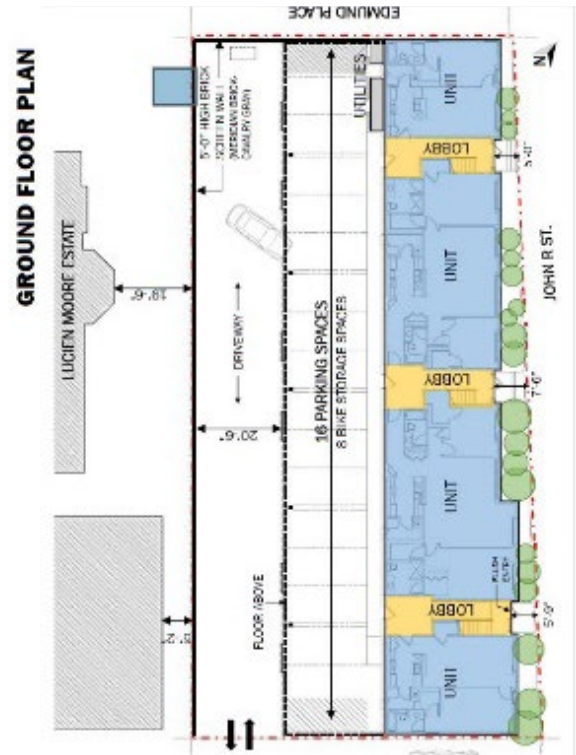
Showing originally approved Site Plan with location of screen wall between 104 and 112 Edmund.
